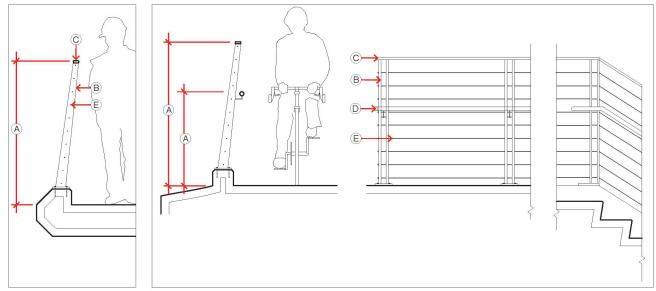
Pedestrian railing type 1 Exhibit 2.35-101: Pedestrian railing type 2 typical section and elevations
